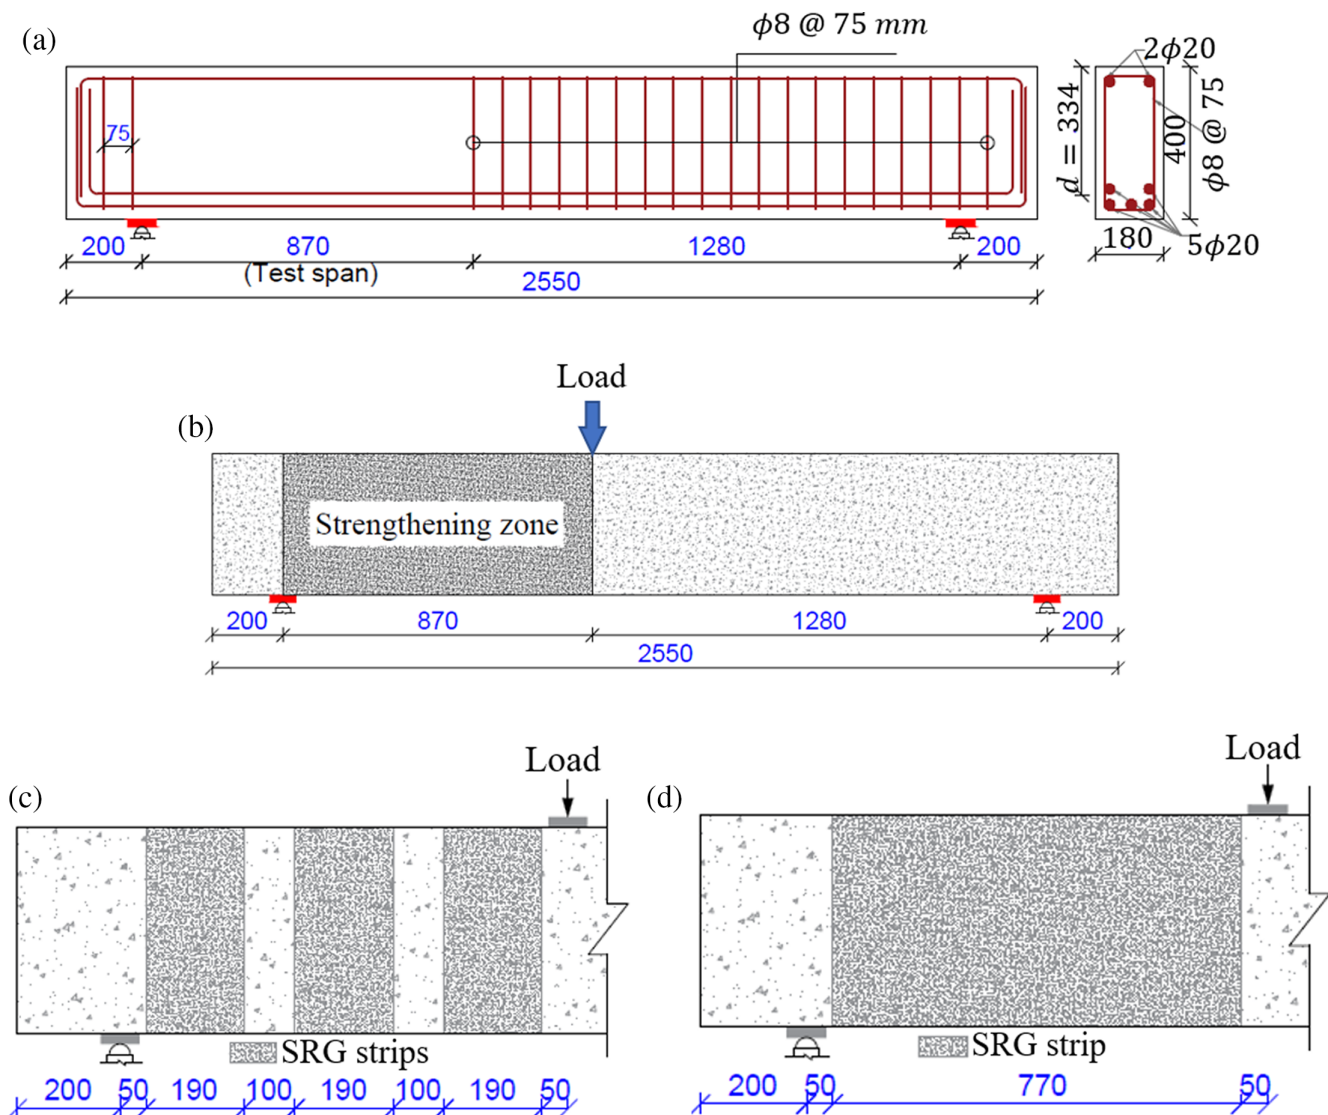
Details of tested beams (a), strengthening area (b), and SRG layout (c and d) (dimensions in mm). SRG, steel reinforced grout
